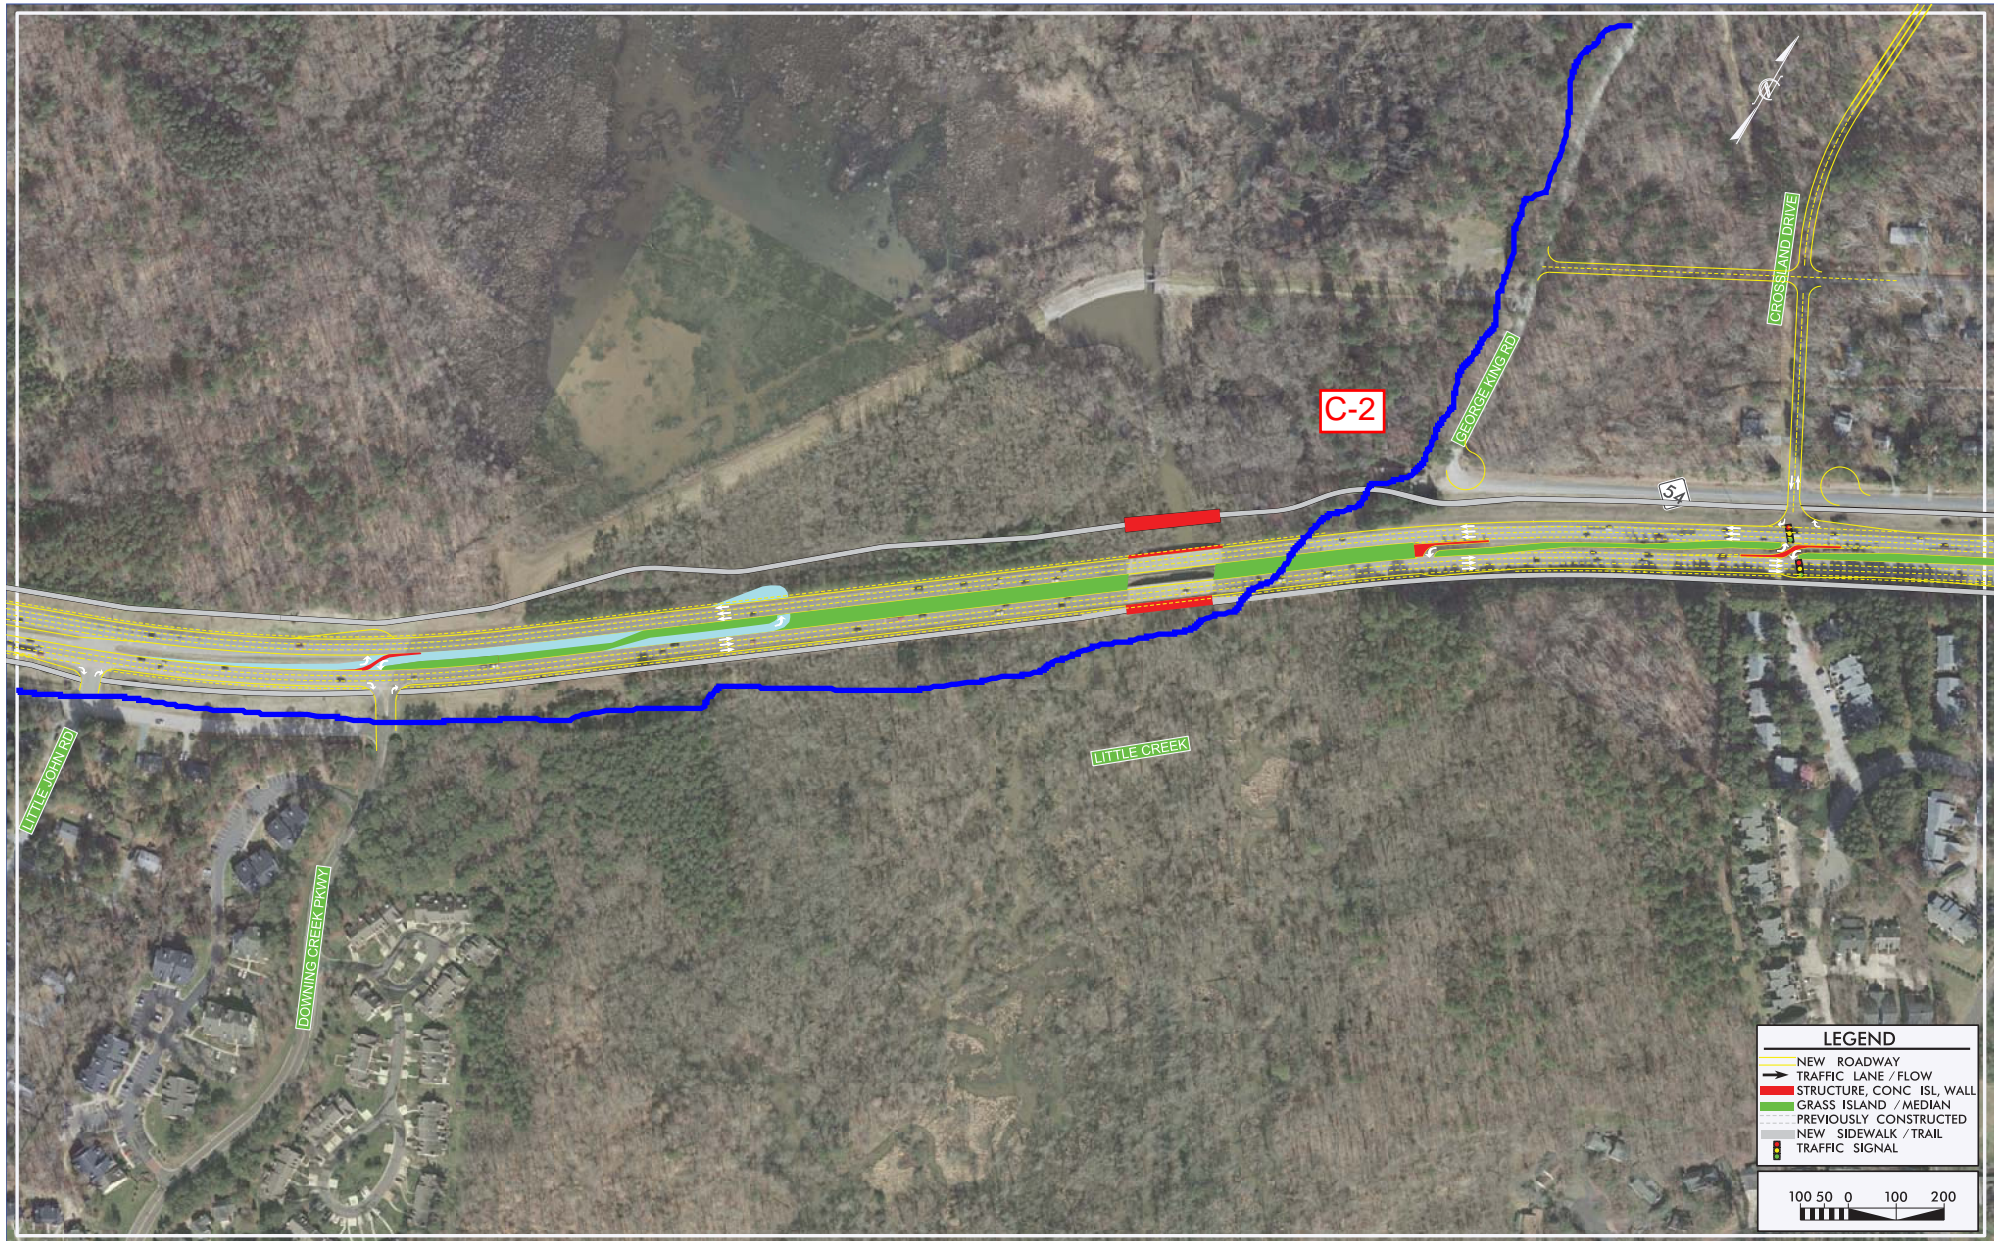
Combined NC 54 Roadway Recommendations Sheet 4 - Little John Road to Crossland Drive
